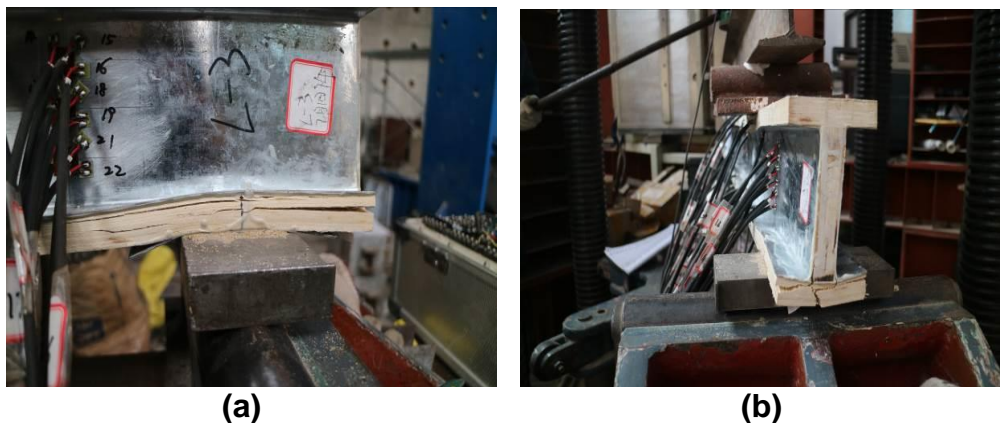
Failure modes of L-3: (a) steel channel bent and (b) the lower flange plywood cracked
